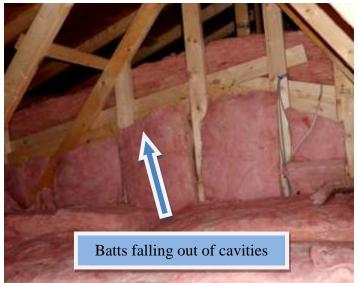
Poorly Installed Fiberglass Attic Wall Insulation
